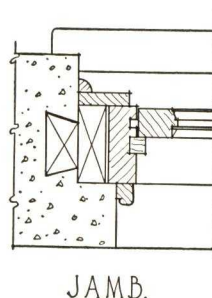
DETAIL "E" SUGGESTED TREATMENT FOR CONCRETE WALLS
